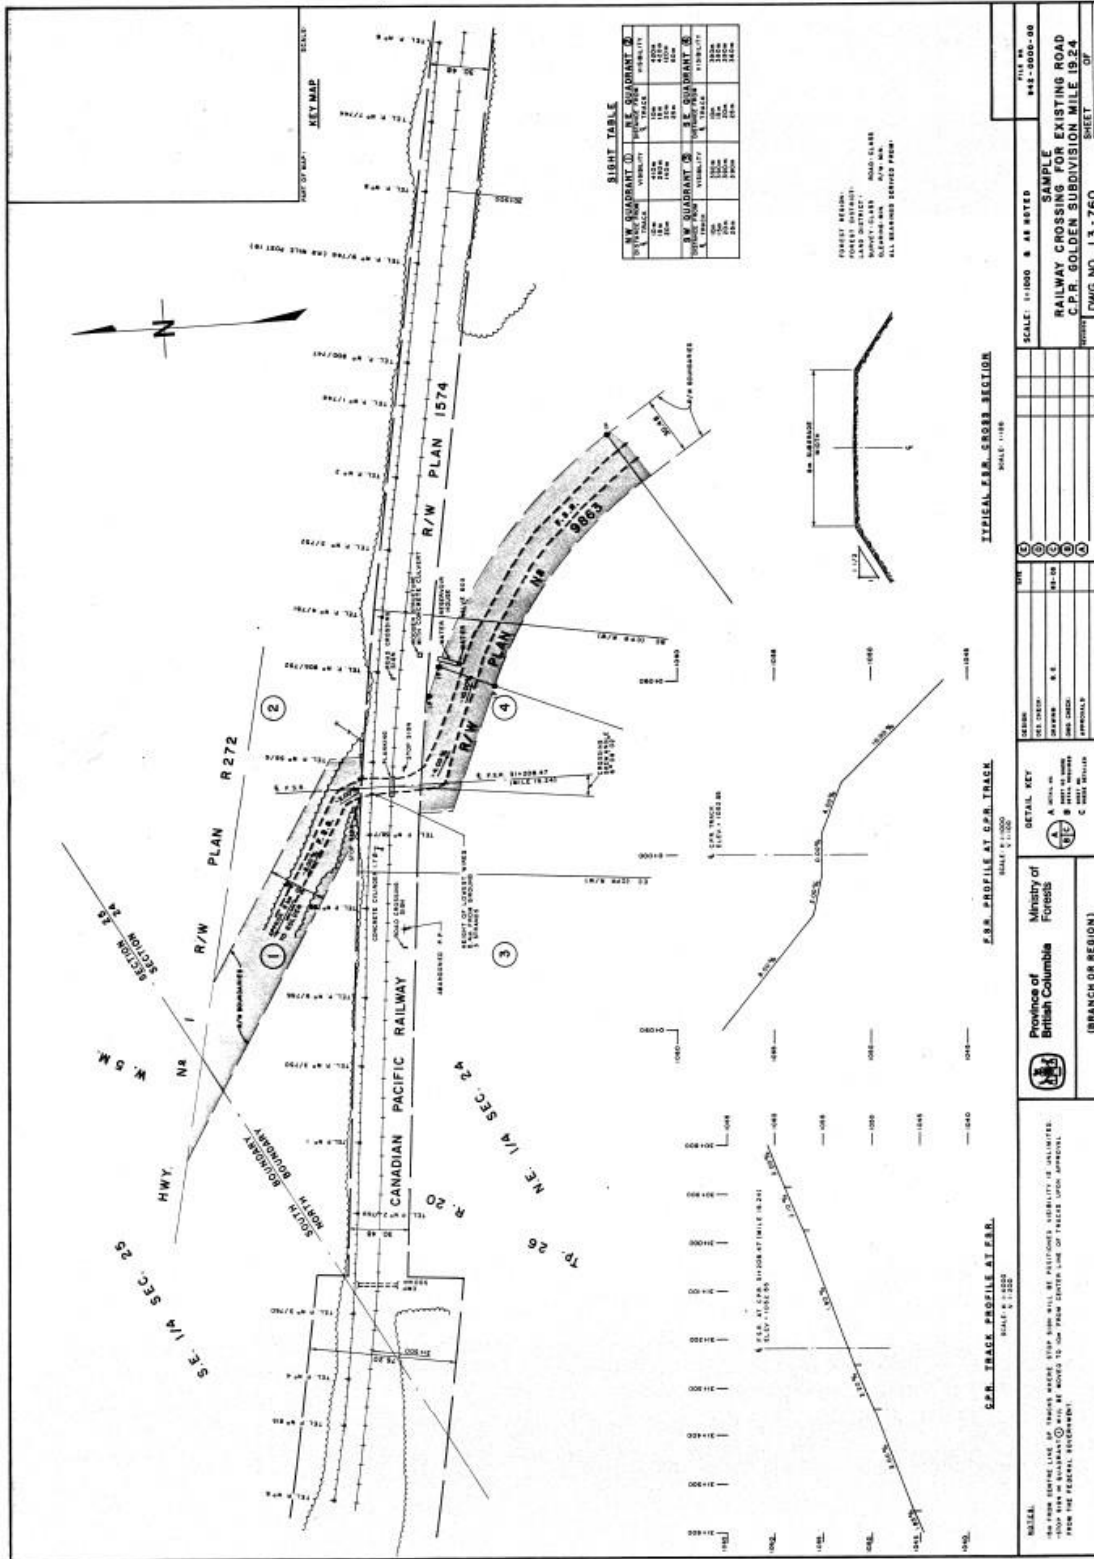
Dwg. No. 13-760 Sample Railway Crossing for Existing Road
